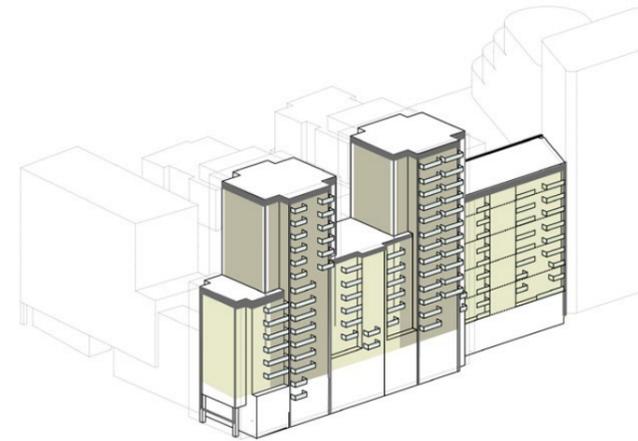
Building B2B3 articulation - Taller tower elements have a different facade treatment, to plinth elements.
